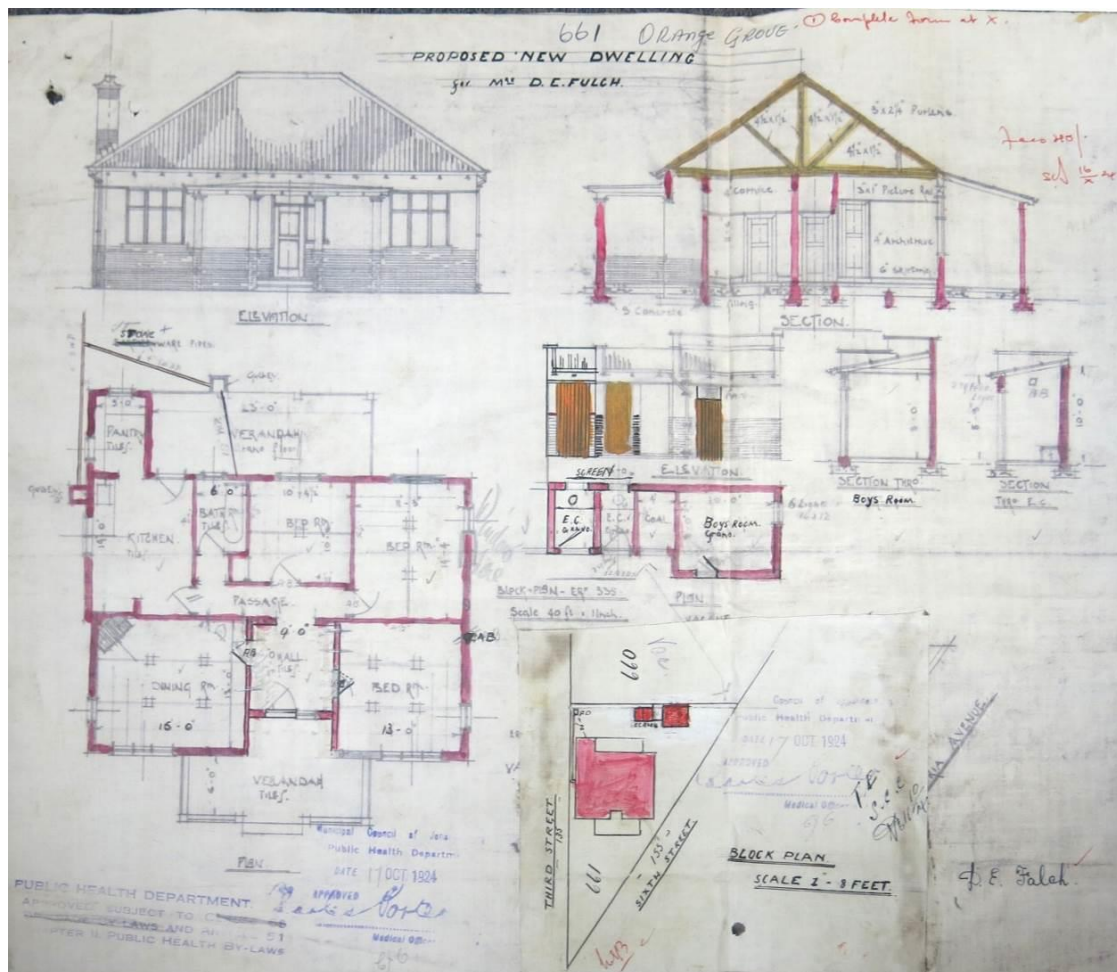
Plan for proposed new dwelling on Stand 661, Orange Grove from 1924
